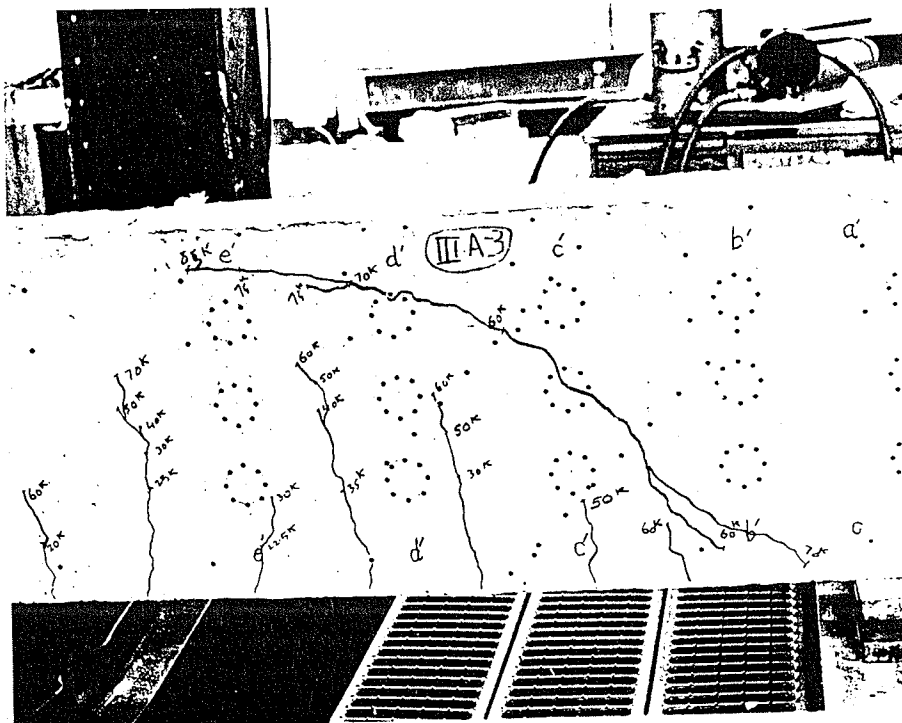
CRACKING ON END N-2 OF BEAM IIIA-3
